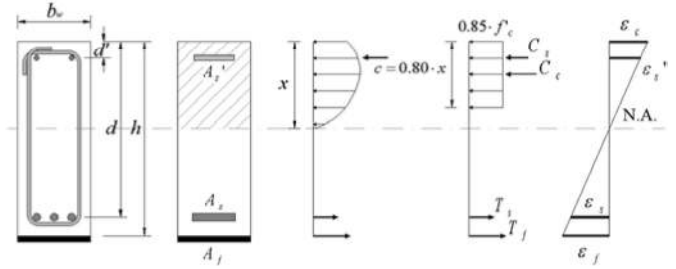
Mechanical behavior of reinforced concrete beams with CFRP
